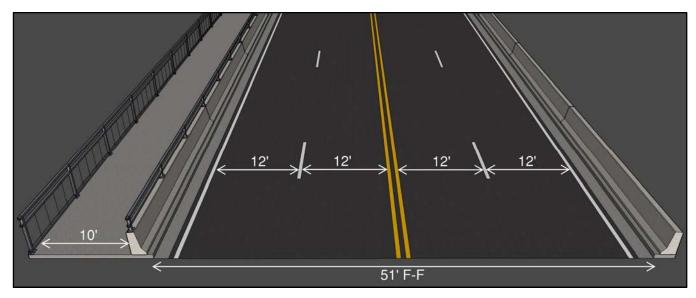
Fox Creek Road Bridge Proposed Typical Section
